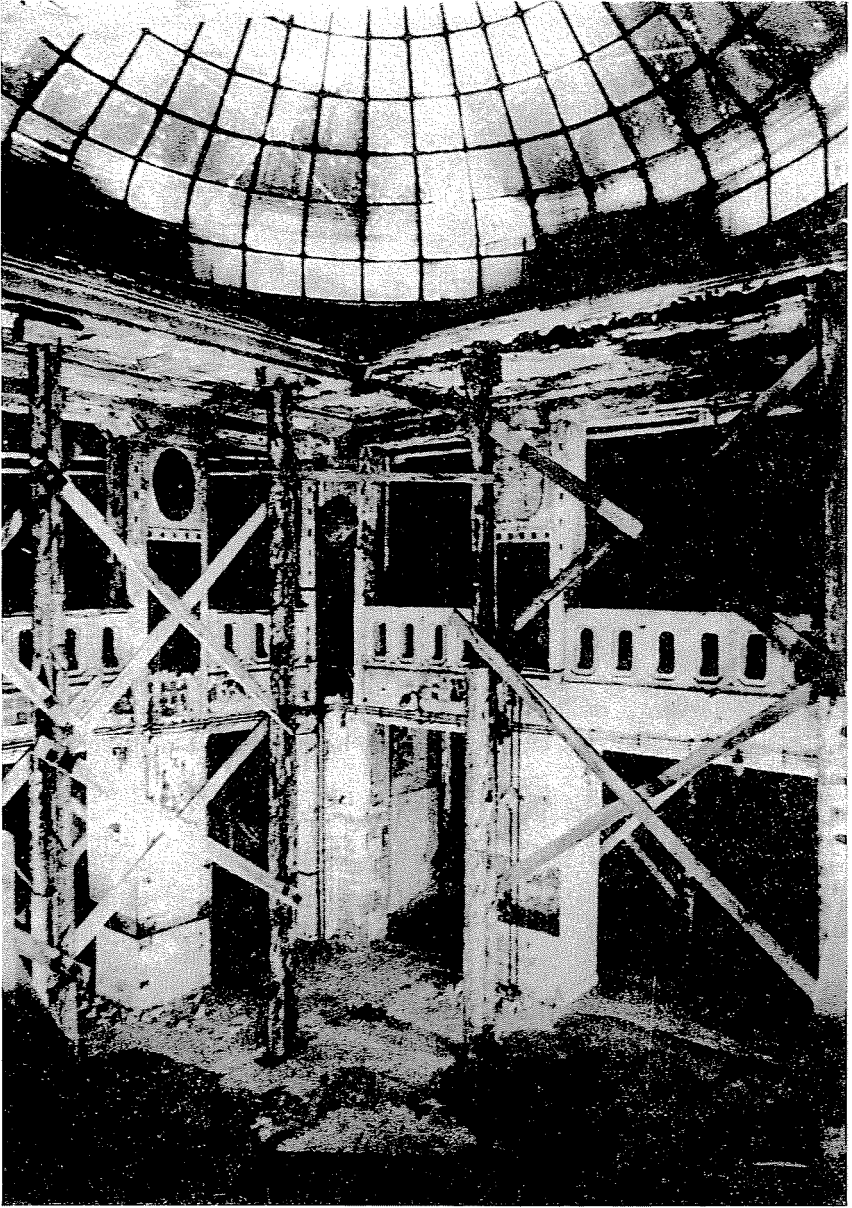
Steam bath for women, 6, Street Klauzál. Central space. Actual condition
